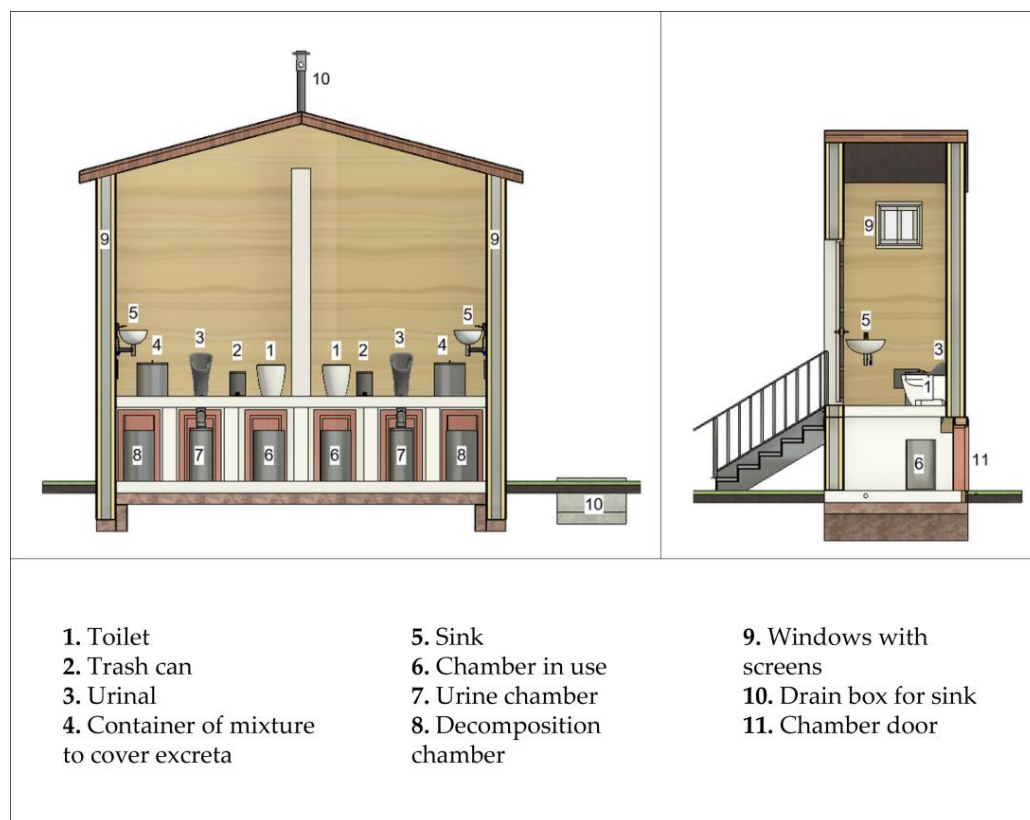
Longitudinal and cross-sectional view of double dry bath.
